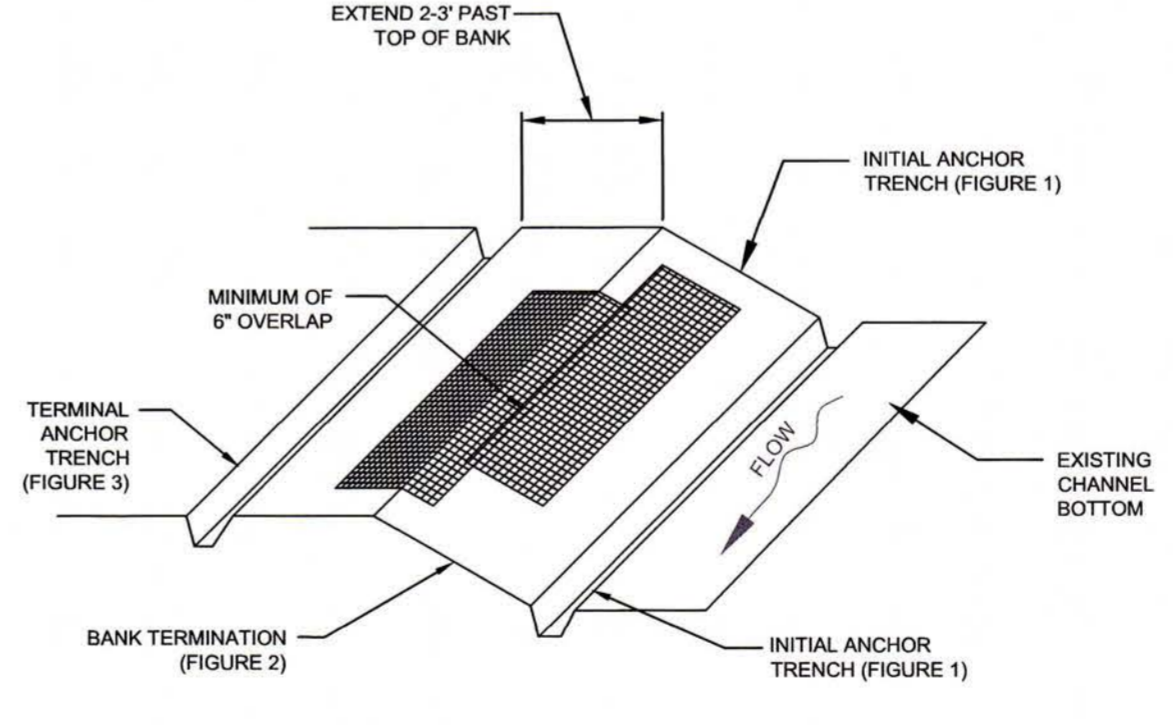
TRENCH AND CHECK SLOT LAYOUT
